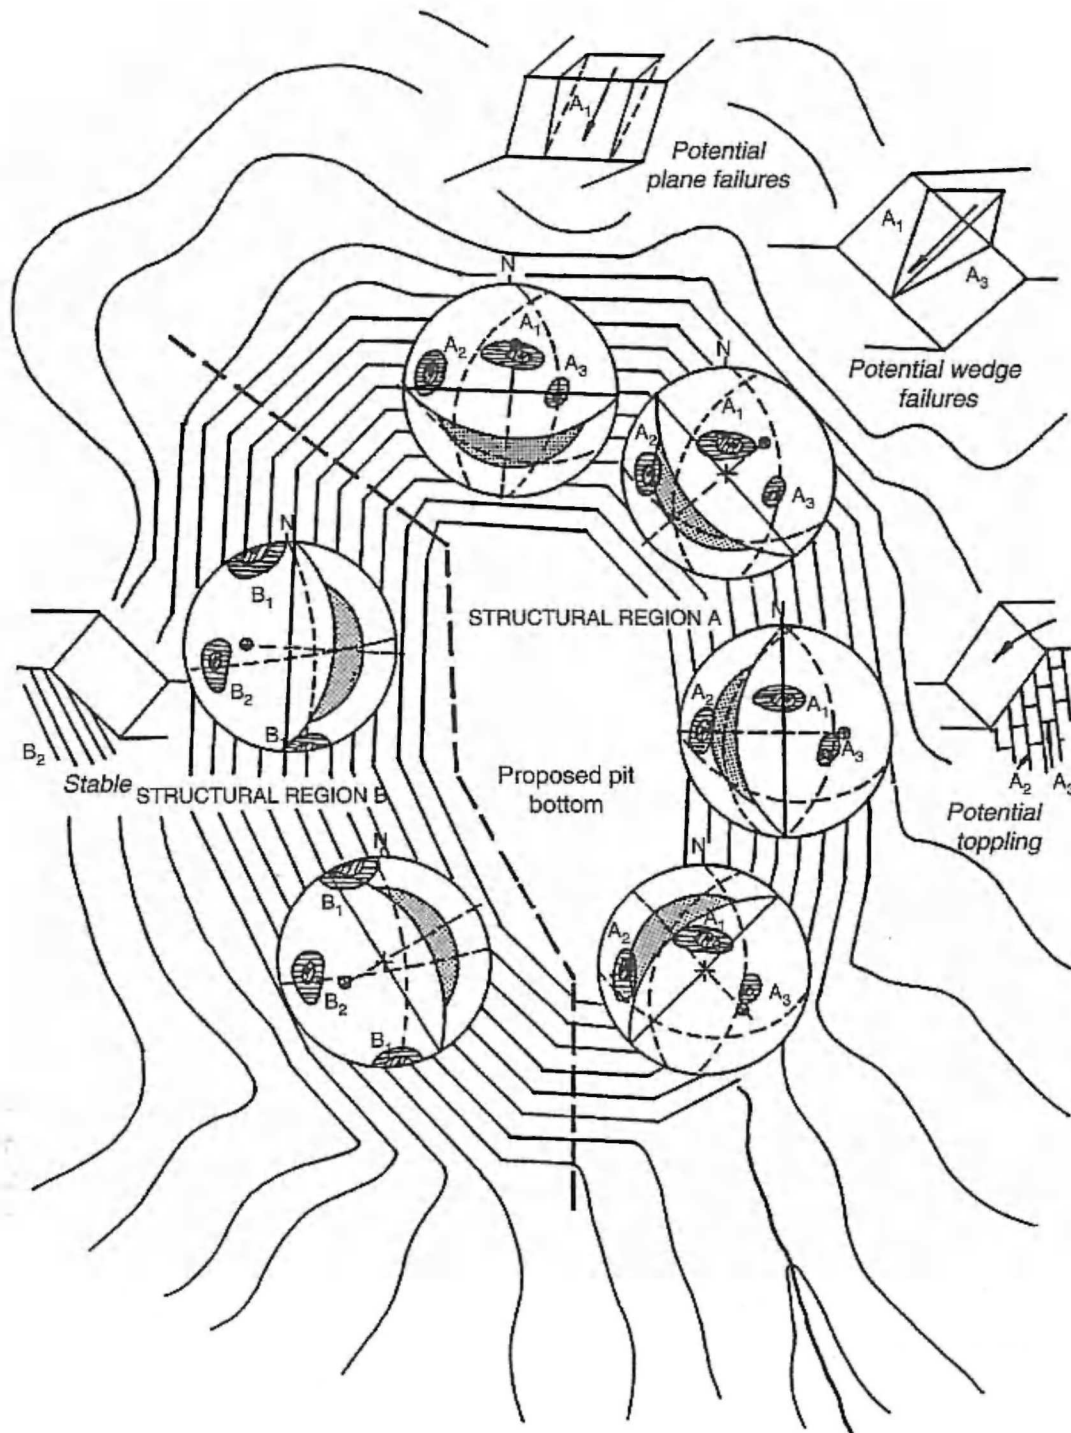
Presentation of structural geology information and preliminary evaluation of slope stability of a proposed open pit mine (Hoek & Bray, 1977).
